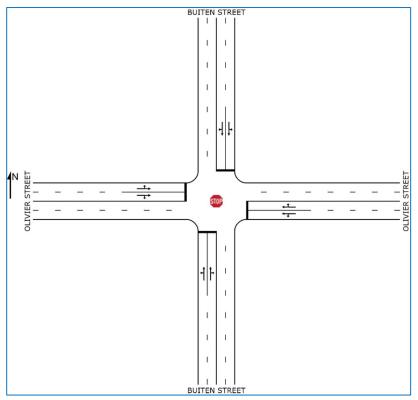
Existing Layout of Olivier (R34) and Buiten Street – Intersection 4
